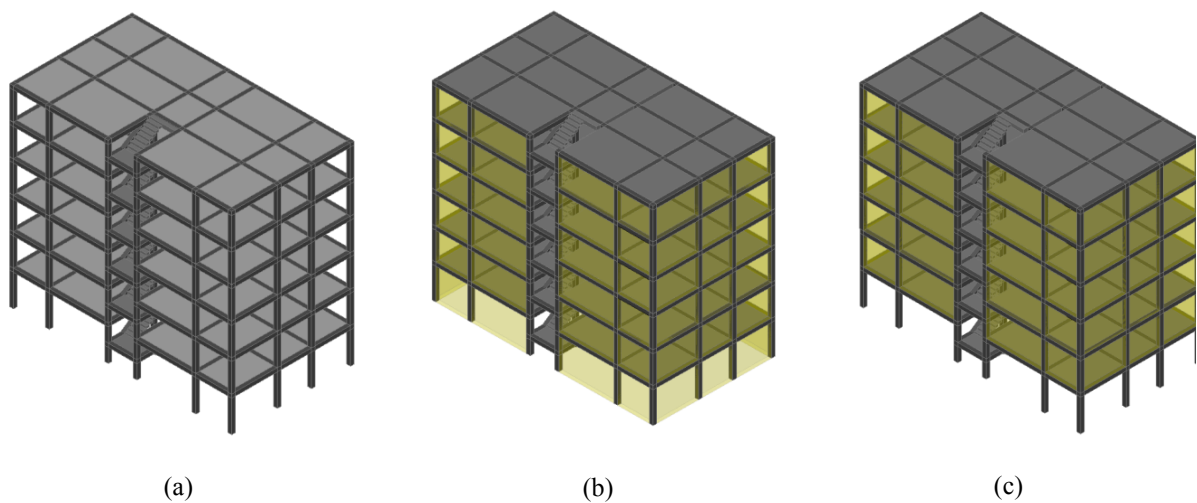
6-story buildings: bare frame BF (a); infill frame IF (b); pilotis frame PF (c)
